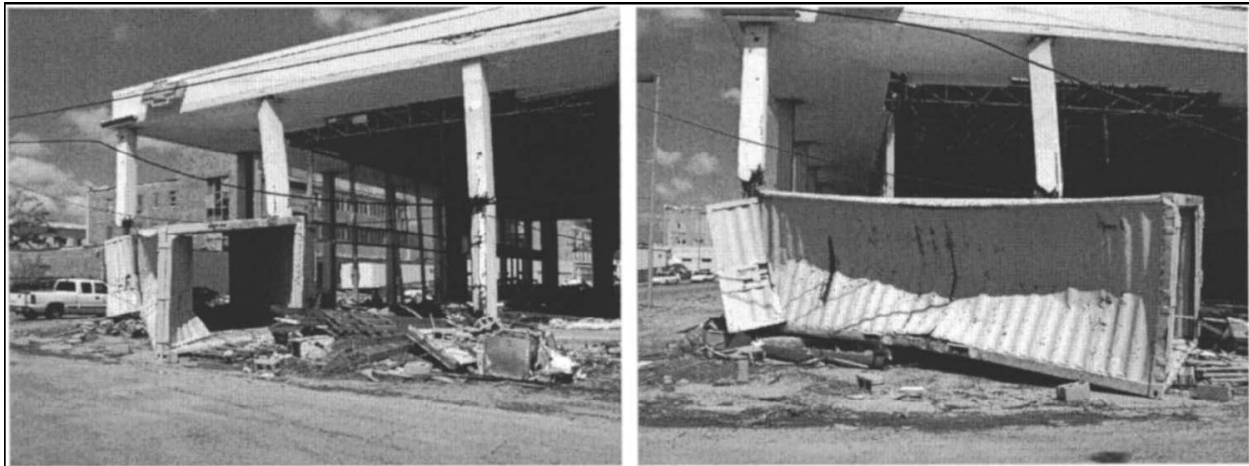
Empty steel shipping container lodged against columns supporting roof (Gilberto et al., 2007)
